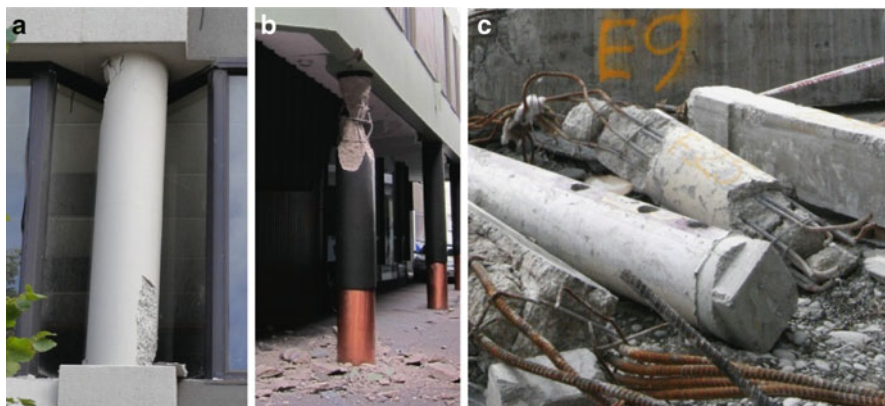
Damage to gravity columns: (a) Spalling and residual draft; (b) crushing; (c) failure of columns in CTV building
